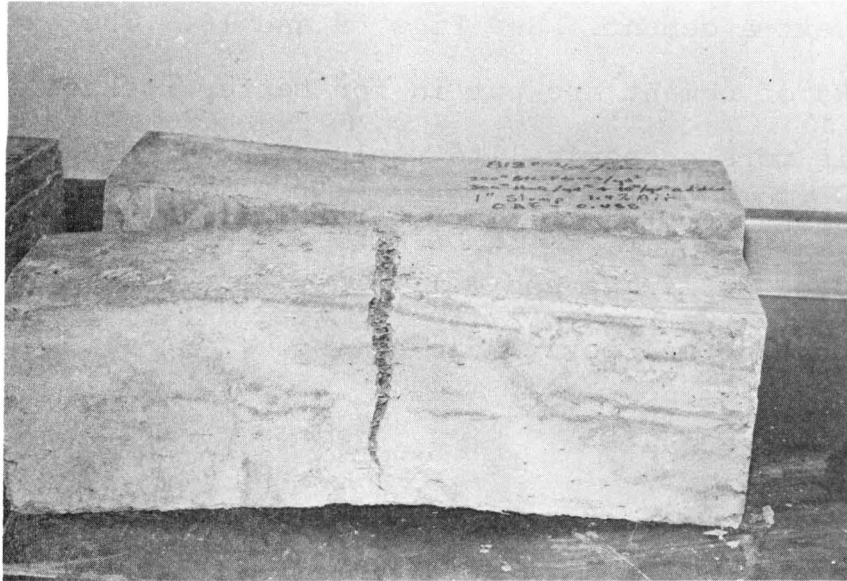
A fibrous concrete beam after being tested to failure. Sudden failure does not occur in fibrous concrete due to the bond between the fibers and concrete.
